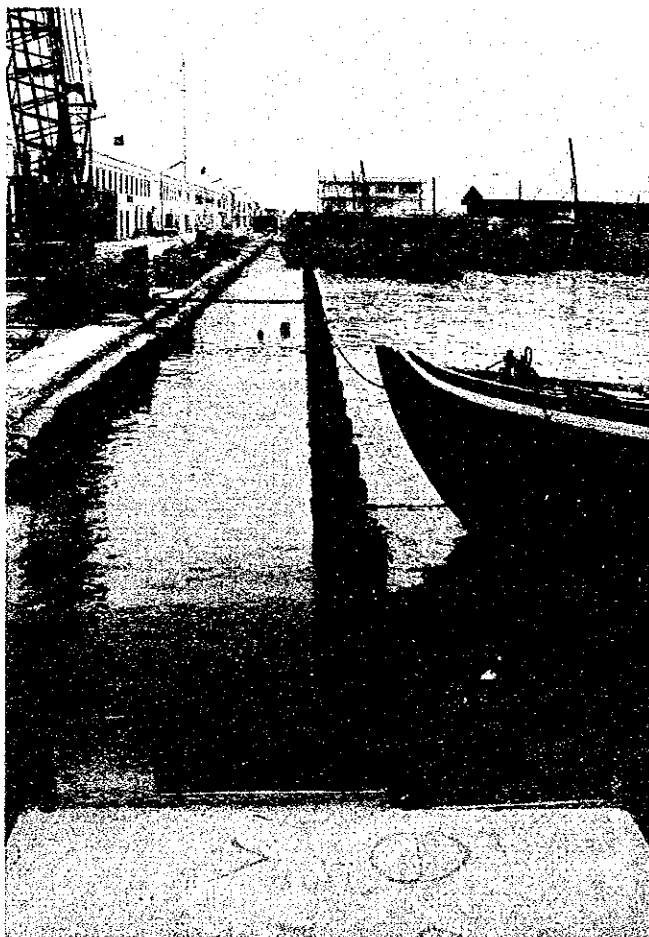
SHEET PILING SEAWALLS (Sep. 1991)
